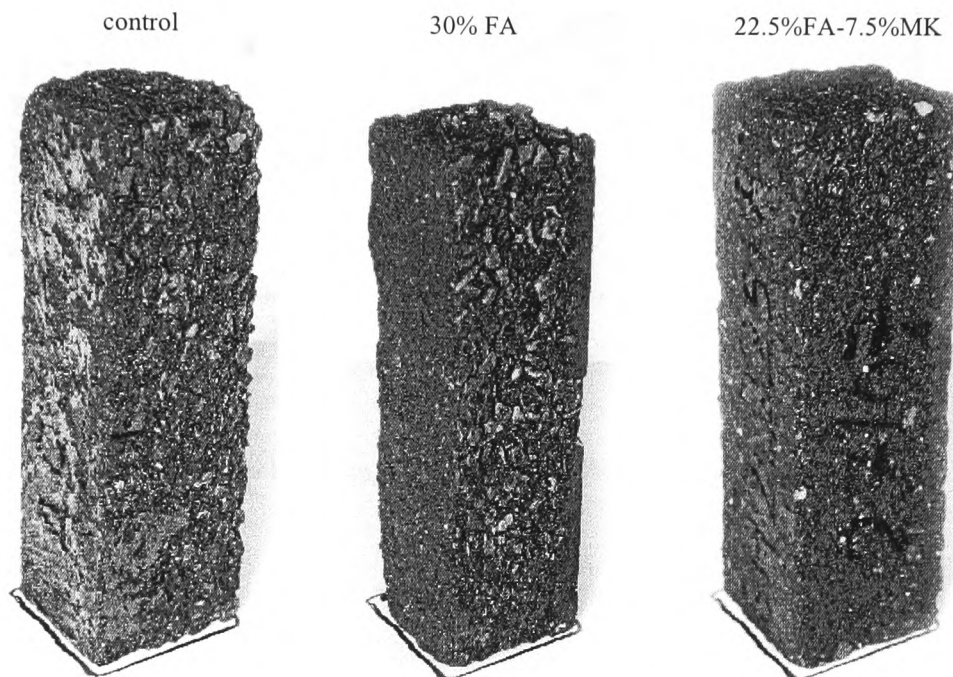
Condition of air-entrained control concrete specimen and concrete specimens incorporating pozzolans at 30% total replacement level, after 120 cycles of freezing and thawing.
